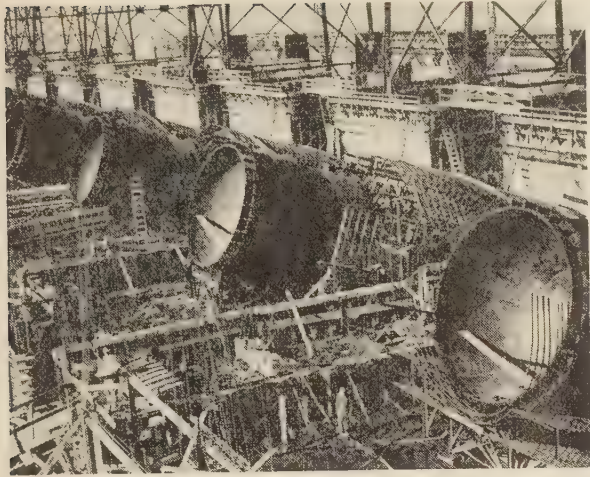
UPSTREAM SECTIONS OF 18-FT-DIAM PENSTOCKS IN PLACE IN DAM
